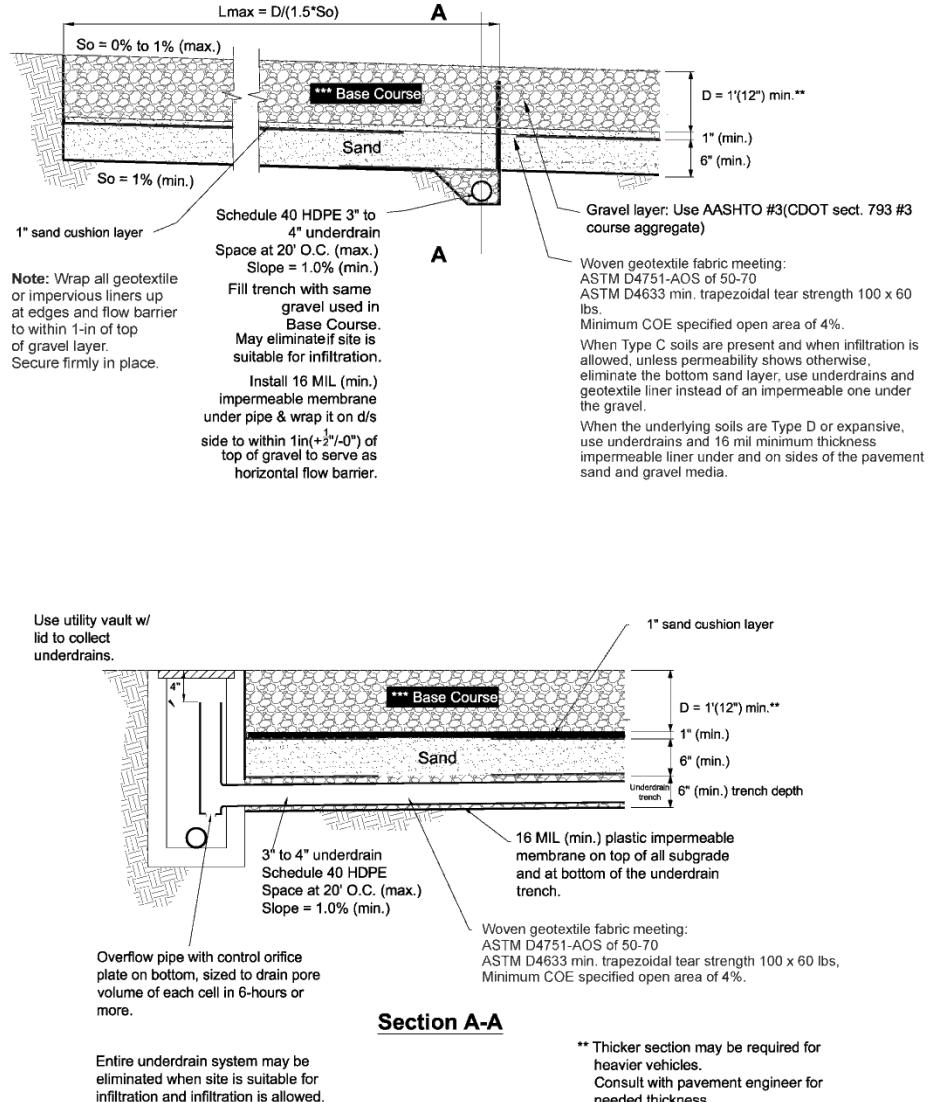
Porous Gravel Pavement, Typical Sections
